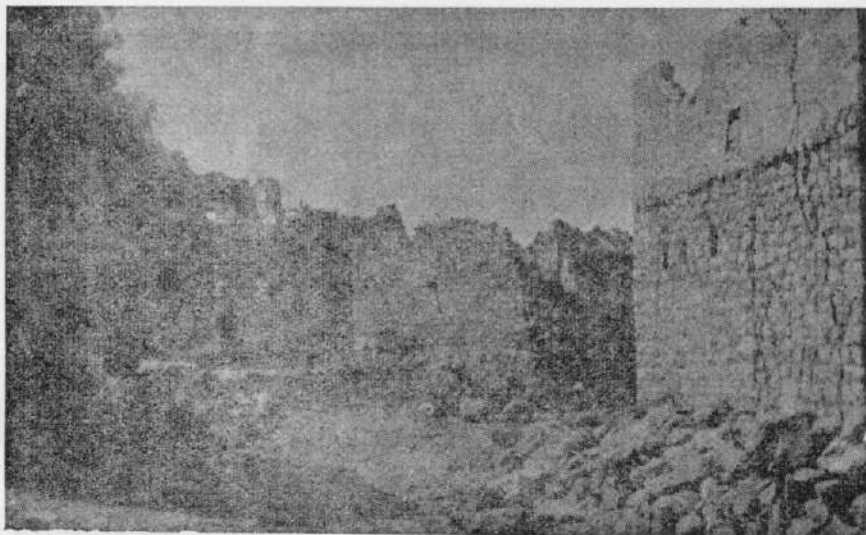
Construction using random stone in lower floor and adobe on upper floor in village Dohran, cracks and collapse of wall.
